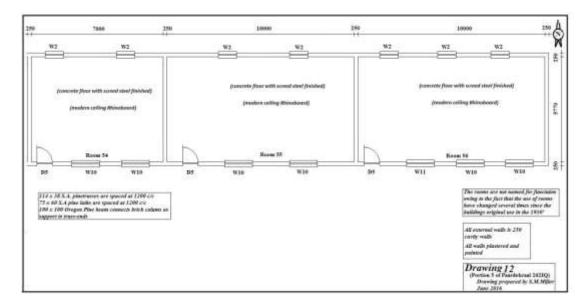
Above. Layout of rooms 54 to 56. (Drawing S.M. Miller 2016.)
